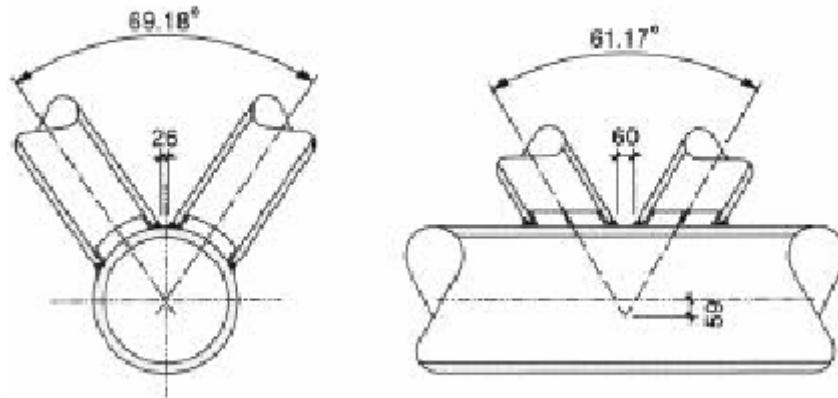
Bottom Chord to Diagonals Joint Connection Detail
